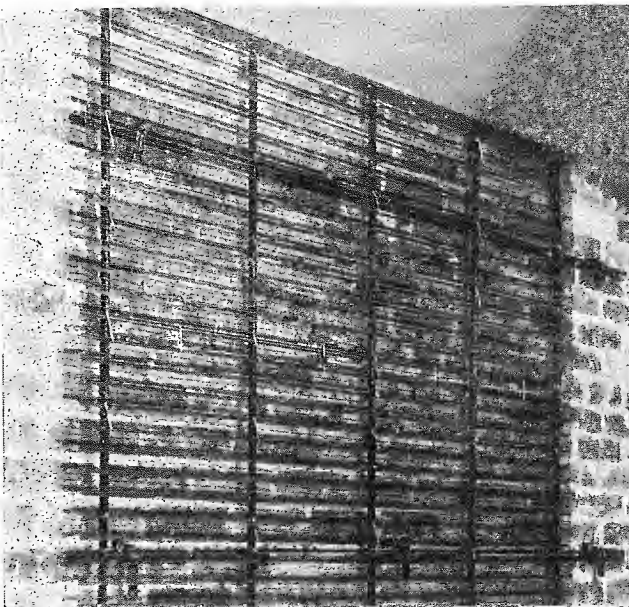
A. (ABOVE) Showing Bracing in Rhodes Theatre of Furring to Exterior Masonry, in Some Places 6 Feet Away. This Portion Used for Framing and Support of Indirect Flare Lighting.
